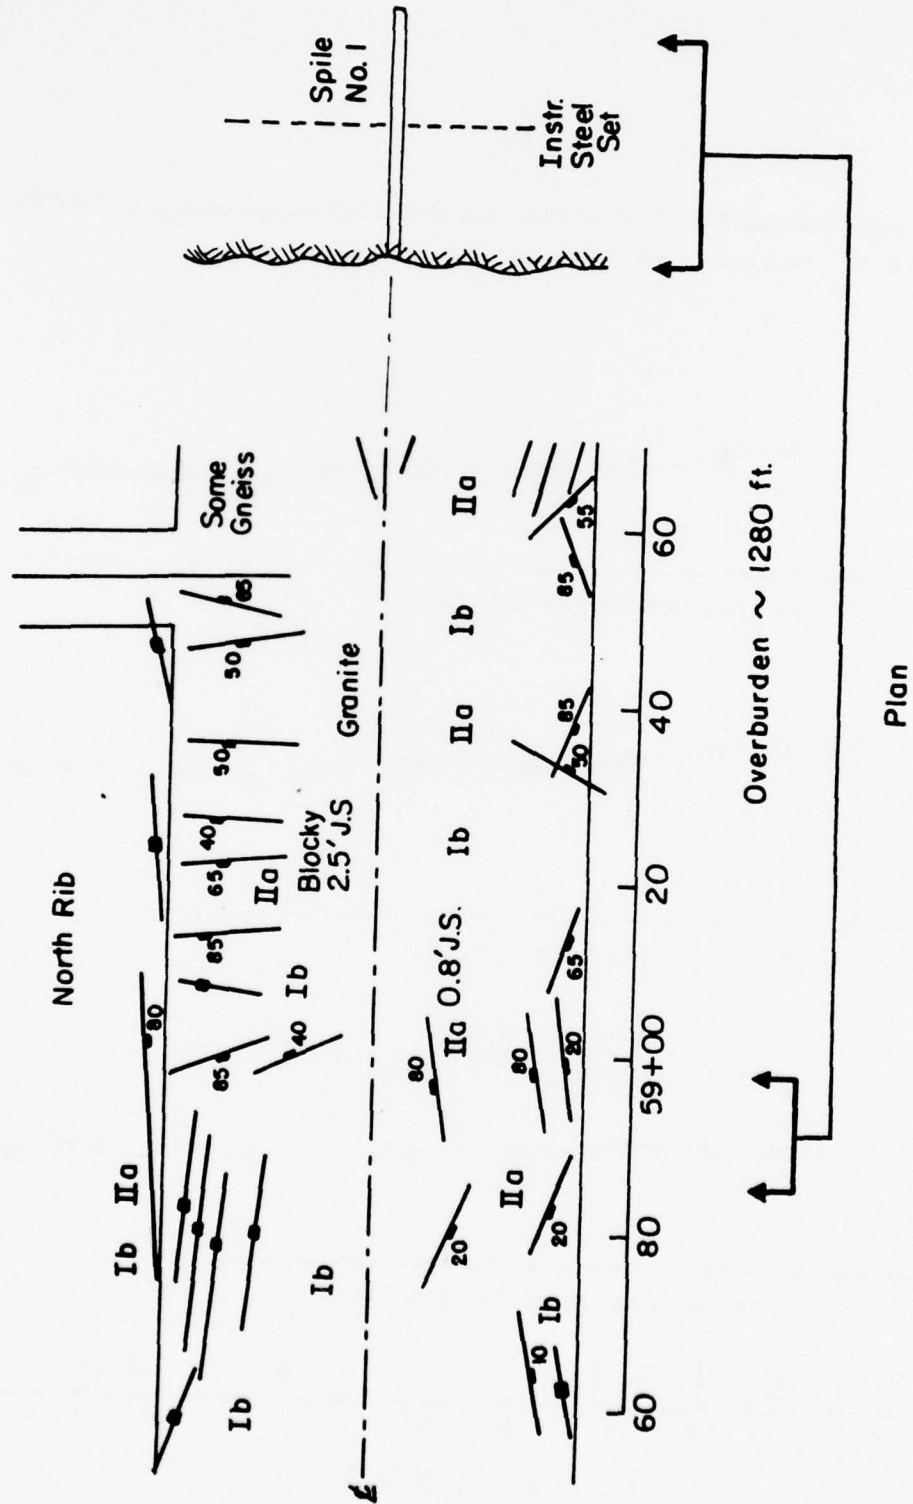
Geologic Map (J. Post, Colo. Div. of Highways) and Instrumentation Layout in Plan, Test Station 58+86
